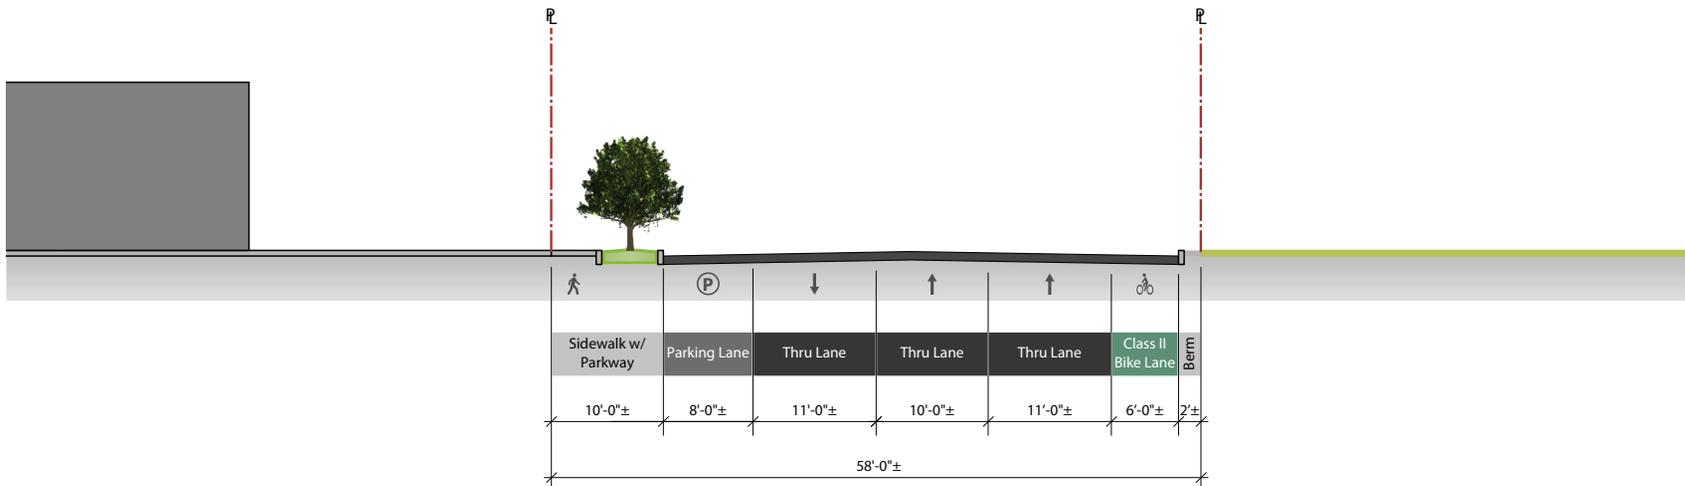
Street Sections: New Neighborhood Connector Streets
